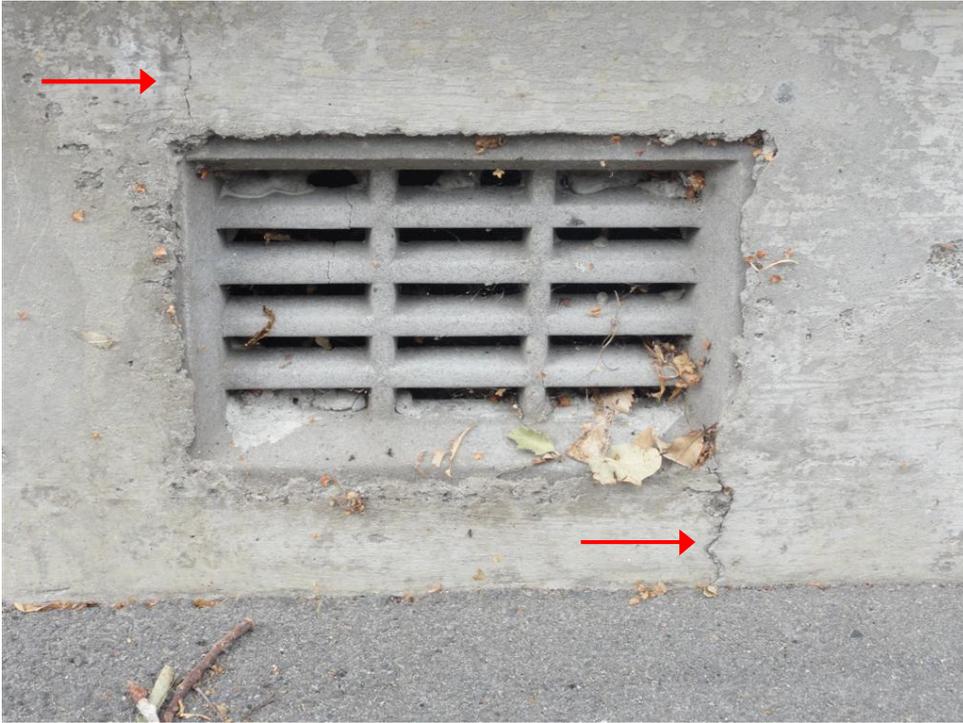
Minor cracking in concrete foundation wall around vent on north-eastern side.
